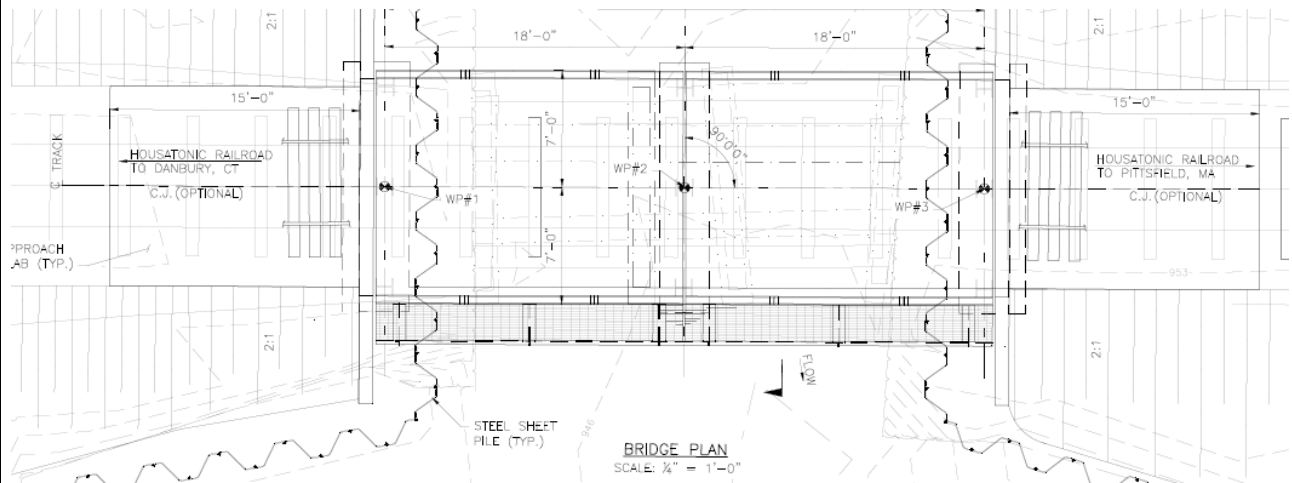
Proposed Bridge Layout Provided by HDR Engineering, Inc.
